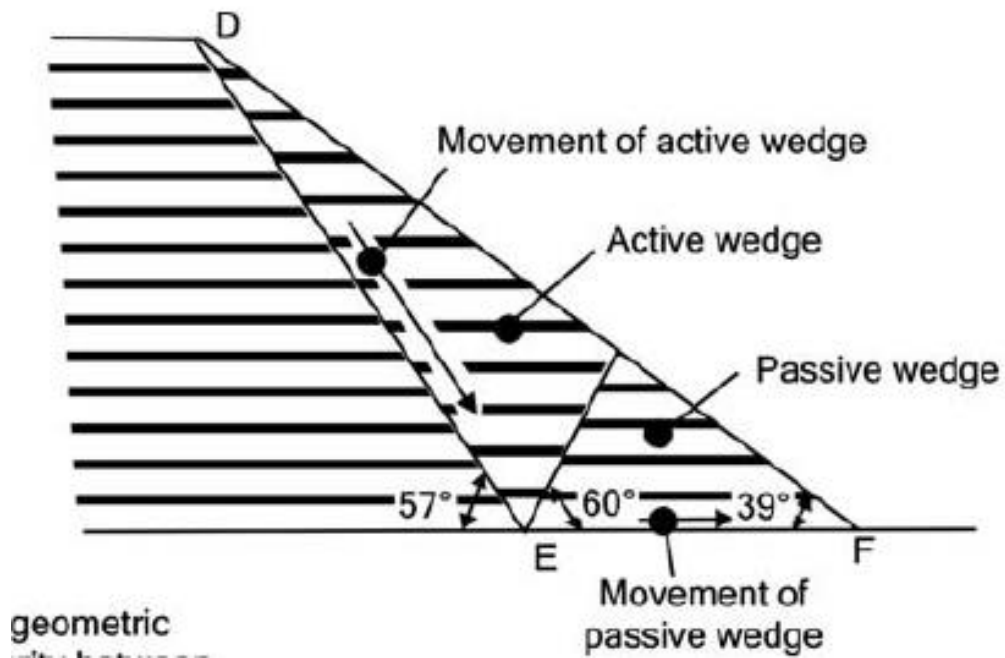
Schematic of a “first-time” failure of a waste rock pile (Blight 2009)
